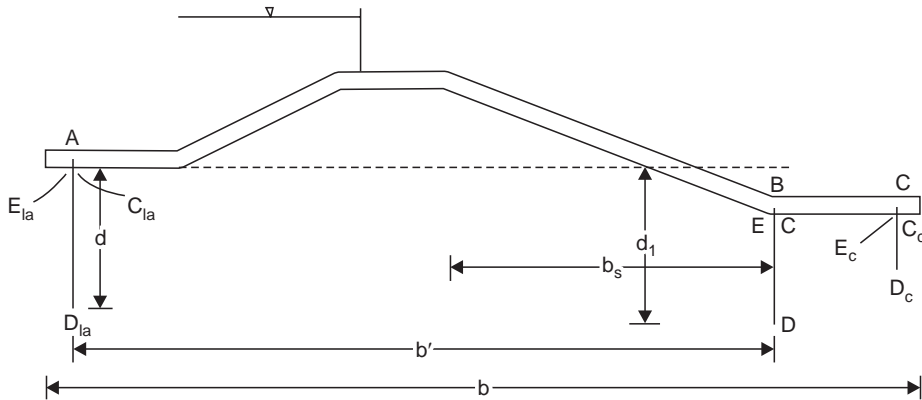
Sketch for mutual interference of sheet piles and for the slope of the floor
